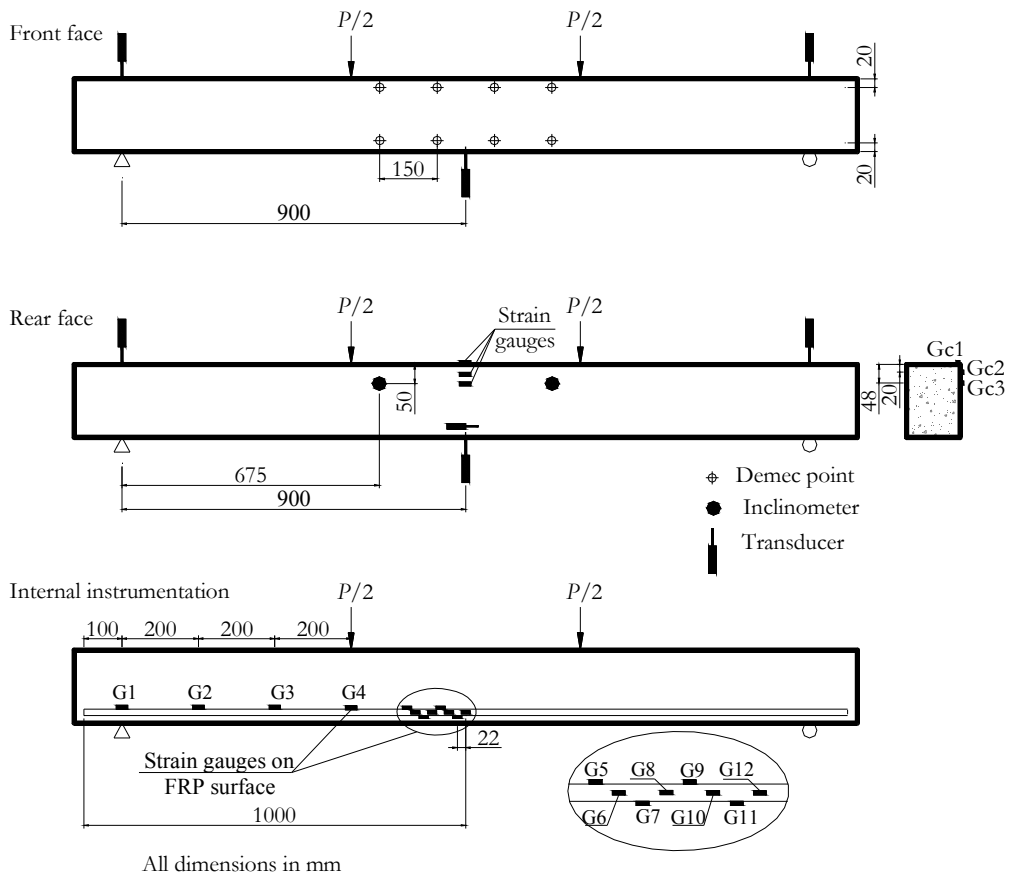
Instrumentation details for beam C2-316-D2-B.
